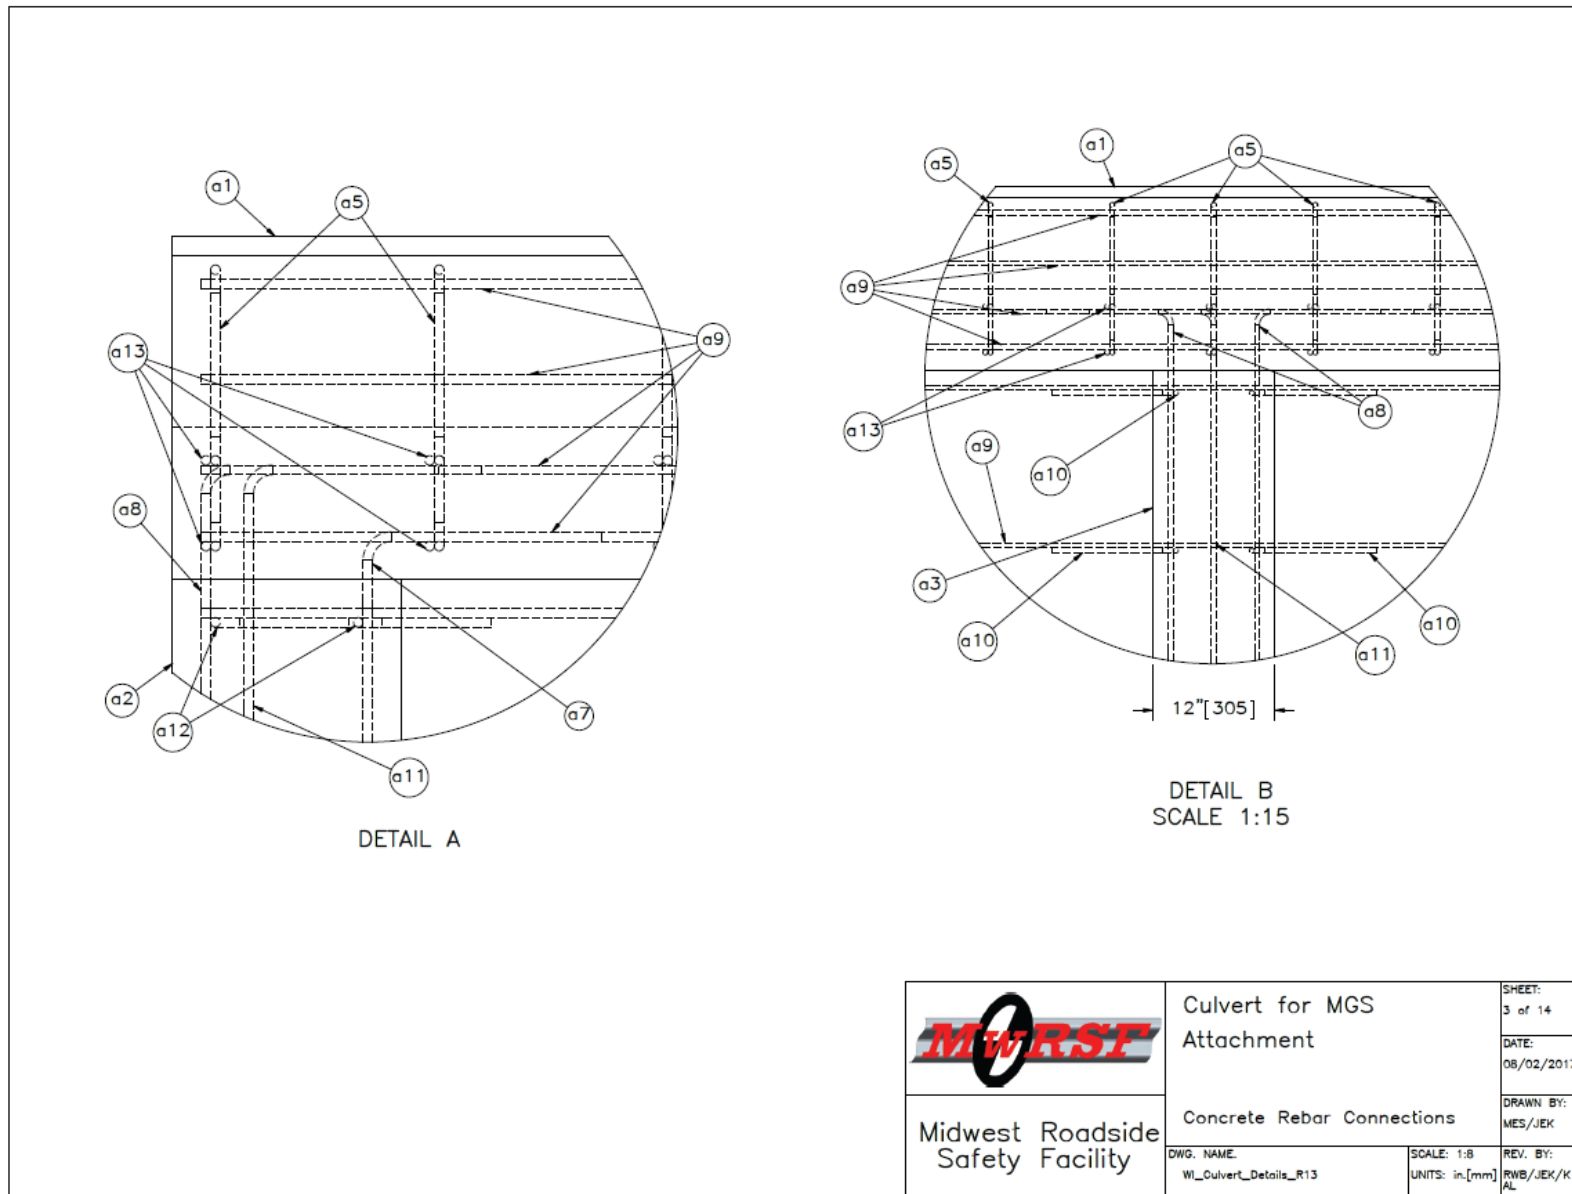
Concrete Rebar Connections, Test Nos. CMGS-1 and CMGS-2
